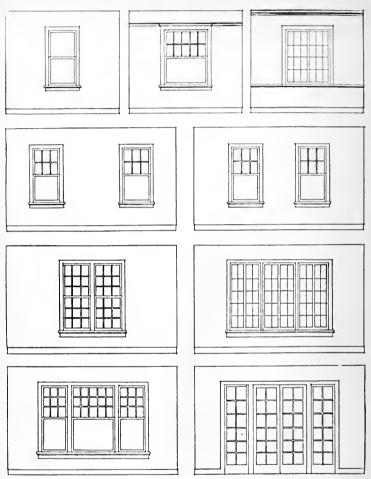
A study of windows in relation to the adjoining wall space. First group: A single win low in the middle of a short wall: a small double-hung window of hald design; a generous double-hung window with pleasing wall space around it; an interesting and well-placed casement. Second group: Two separate windows in a generous wall space: a good arrangement both for distribution of light and for the placing of furniture; a poor arrangement both for lighting and for furnishing. Third and fourth groups: Pairs and groups of windows in a generous wall space: a fair arrangement for a pair of double-hung windows, providing good light and good wall space; an interesting group of easements, dominating the wall space and furnishing abundant light; a pleasing group of double-hung windows; a pleasing arrangement of French windows. The use of moldings in any case must be related to the proportion of the room and the structural line of the openings.
